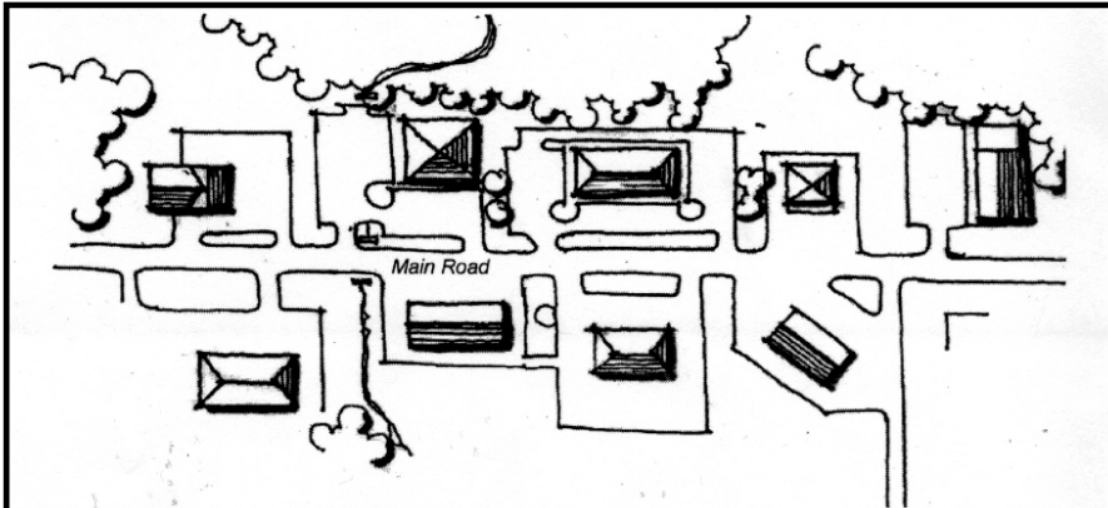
Plan illustrating the negative impacts of multiple curb cuts-removal of vegetation, wasted pavement for parking, and hazardous vehicle entries and exits.
